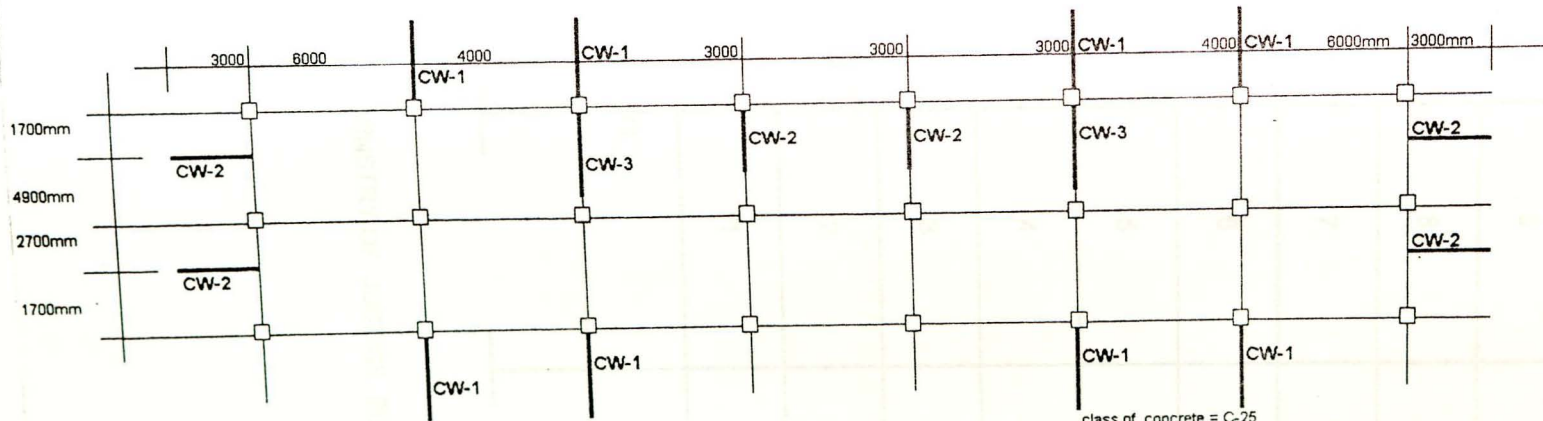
MINISTRY OF JUSTICE FLOOR PLAN
